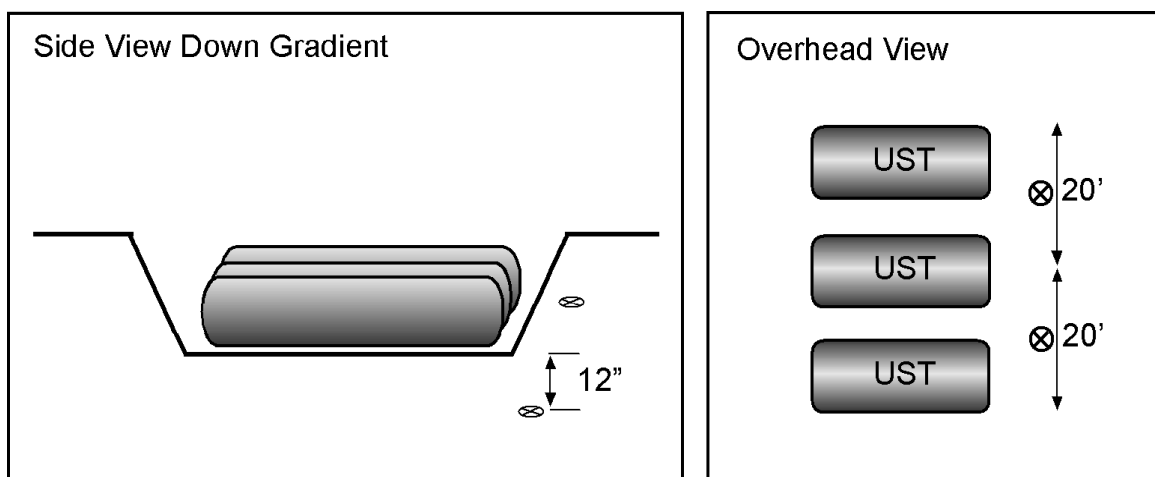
(d). Hydraulic Downgradient Wall Sampling, Greater than 20 Feet of Wall
